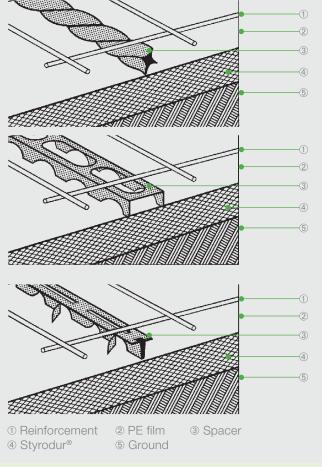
Walkable plastic spacer for horizontal reinforcement. The height of the concrete cover is predetermined by the profile height.
